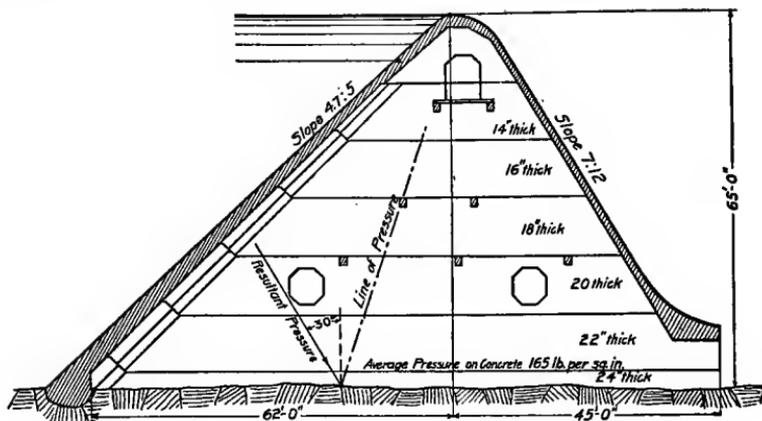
ELLSWORTH (MAINE) HOLLOW DAM.
